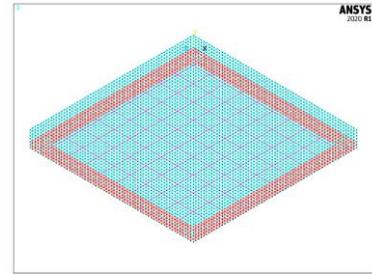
Reinforcement distribution and CFRP laminates layout of model SC
